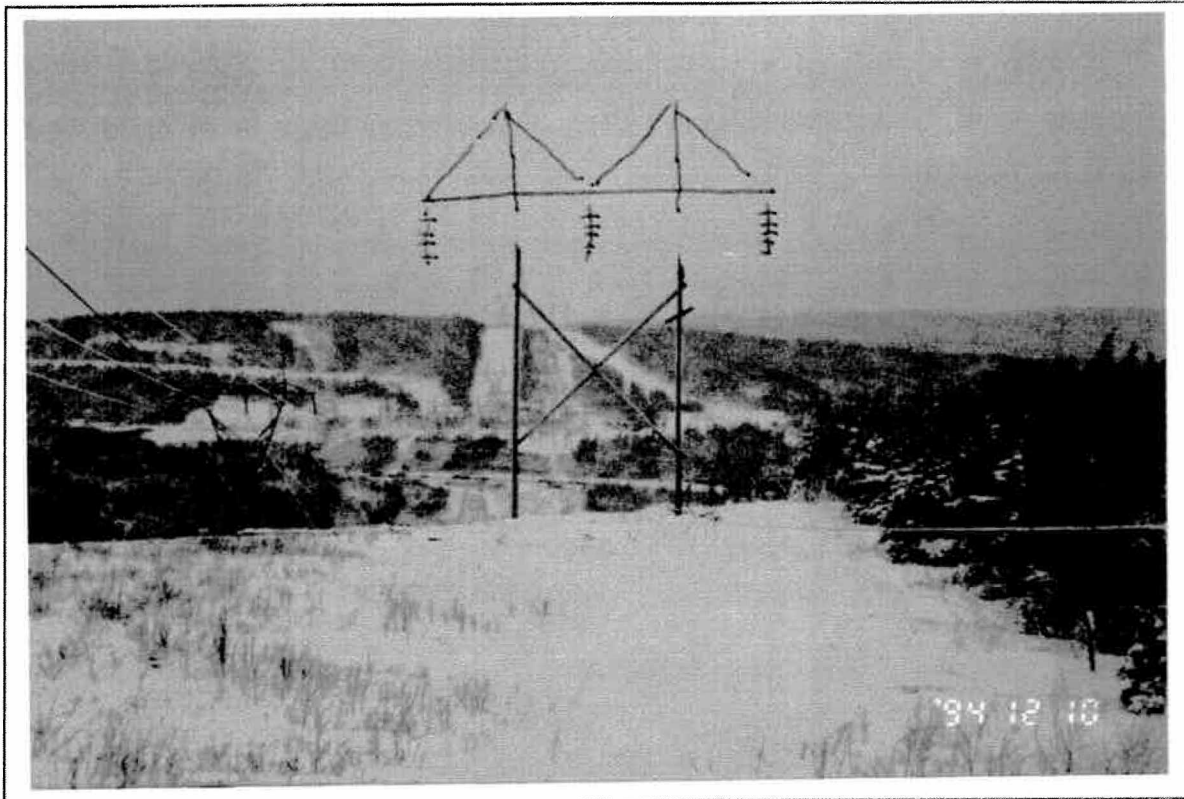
TL201 - Str.#3 - Type D. Failed Welded Eyebolt.
